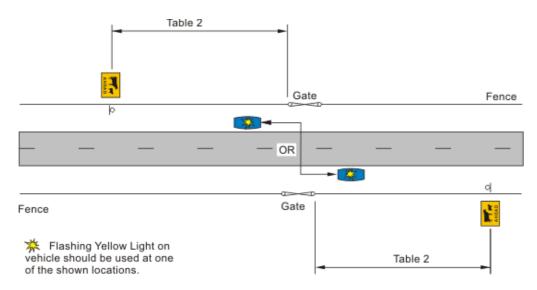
Typical Stock Crossing Site – for bitumen roads/gravel roads. NOTE: Gravel roads – there is no requirement for orange flashing lights
